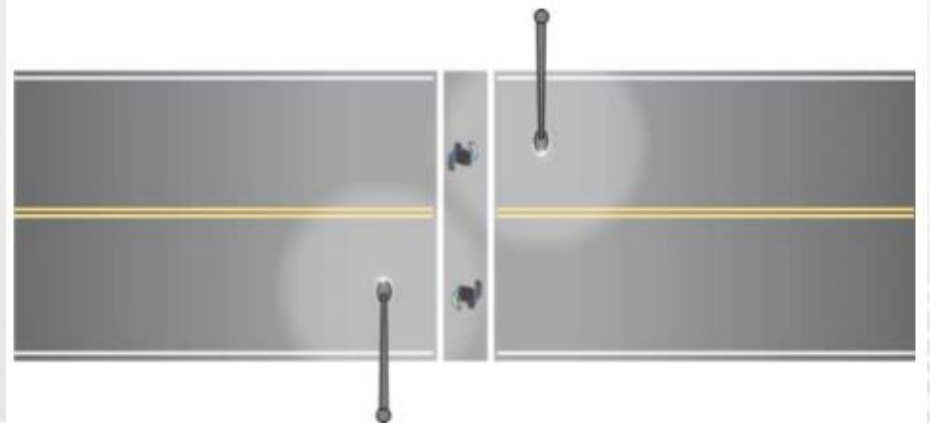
Drawing. New design for midblock crosswalk lighting layout.
